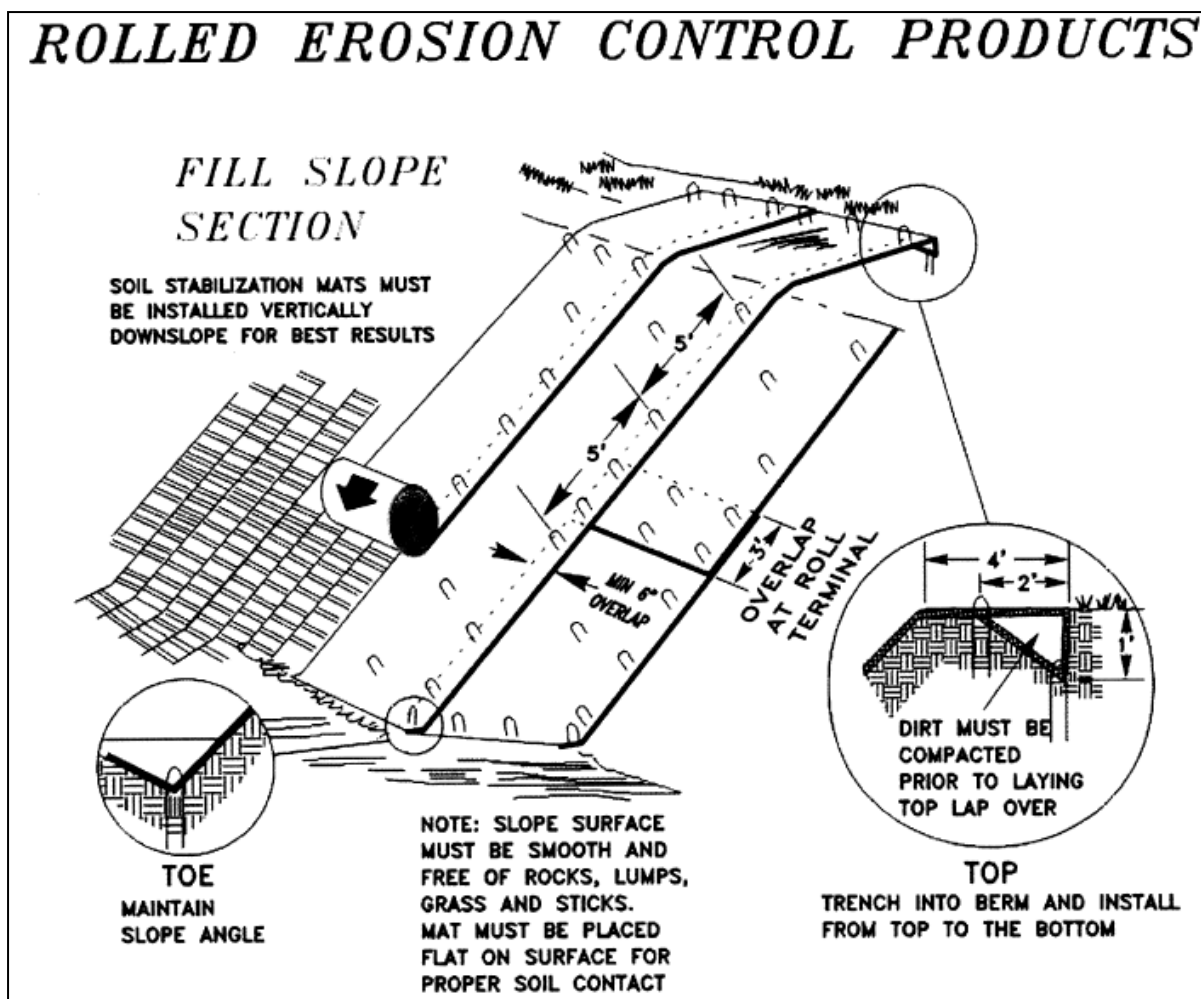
Example of methods recommended to install erosion control matting on sloping areas such as the dam wall embankment that require revegetation (Source: Department of Environmental Protection, West Virginia)
